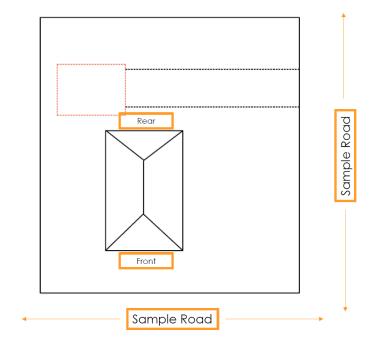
Example of appropriate new outbuilding placement on a corner property with side yard driveway access
